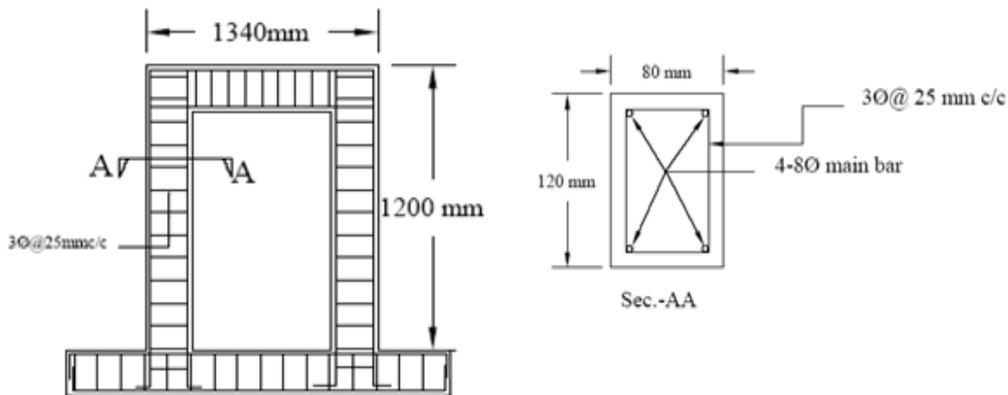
Reinforcement details of the RC bare frame model under pushover loading
